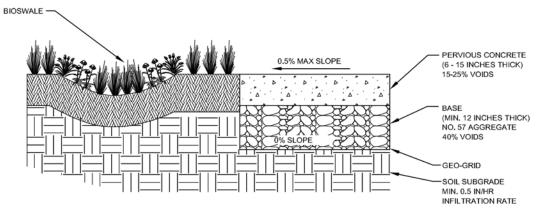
B. Pervious Concrete with Bioswale Outlet
